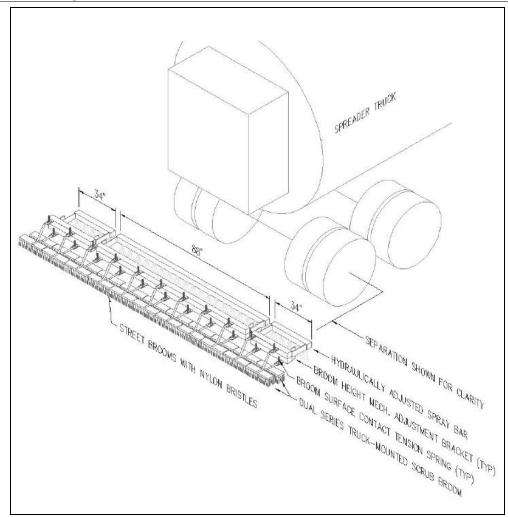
Truck Mounted Emulsion Scrub Broom Assembly
